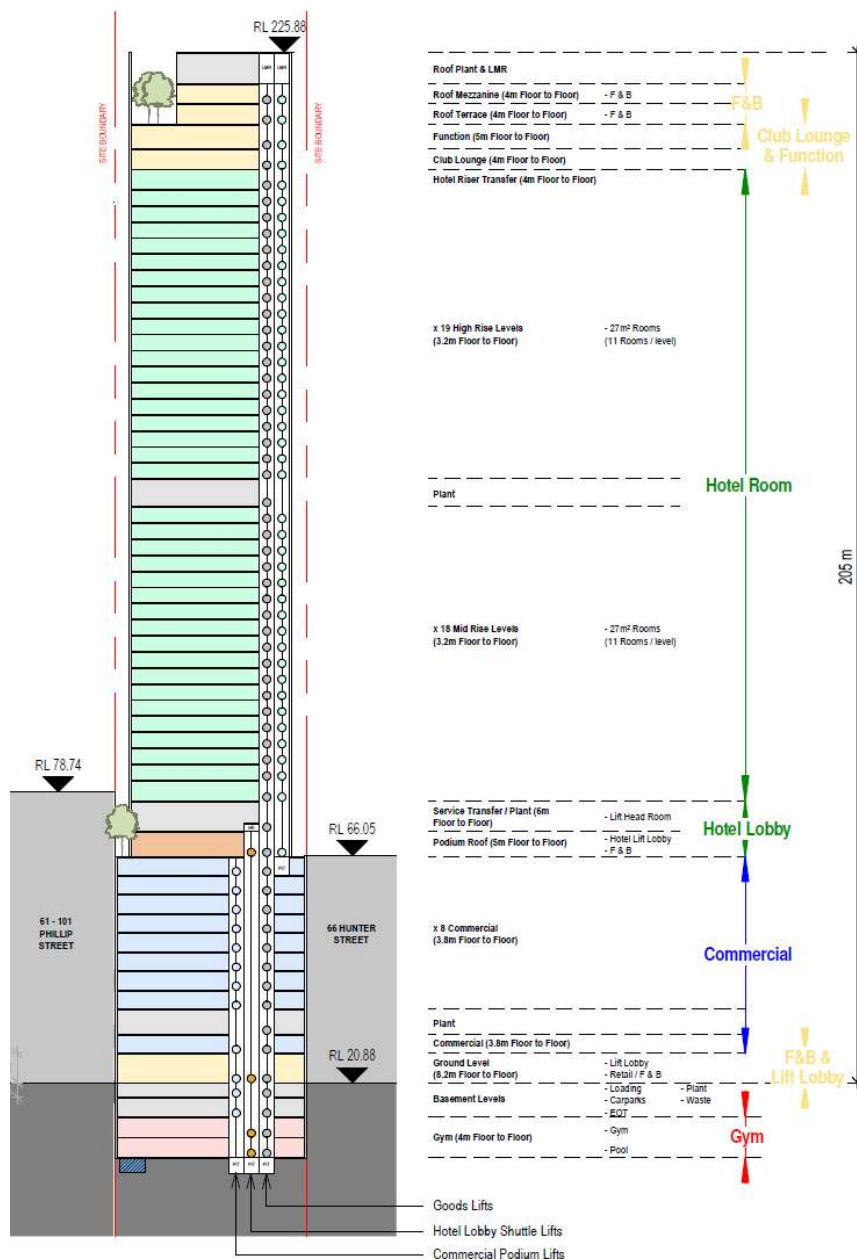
Concept design for 4-6 Bligh Street, Sydney
